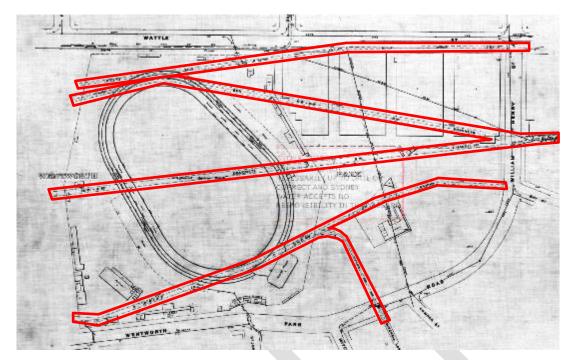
City of Sydney Detail Sheet 438, 1939, showing drainage pipes outlined in red. The top-most drainage pipe (which corresponds to the one on the 1887 plan) is labelled as a brick pipe, while the others are labelled as being made of concrete. (Source: Sydney Water DS438)
